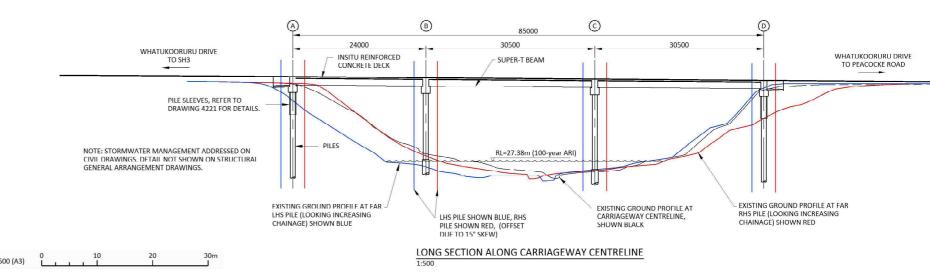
TYPICAL BRIDGE ELEVATION
